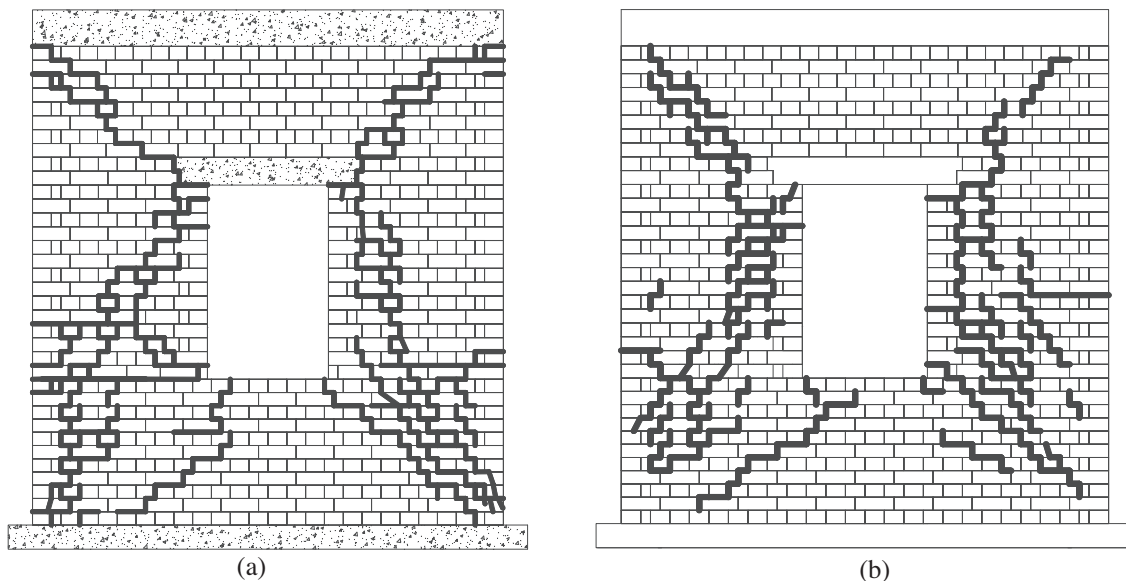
Crack patterns: (a) S1 wall, (b) S2 wall.
